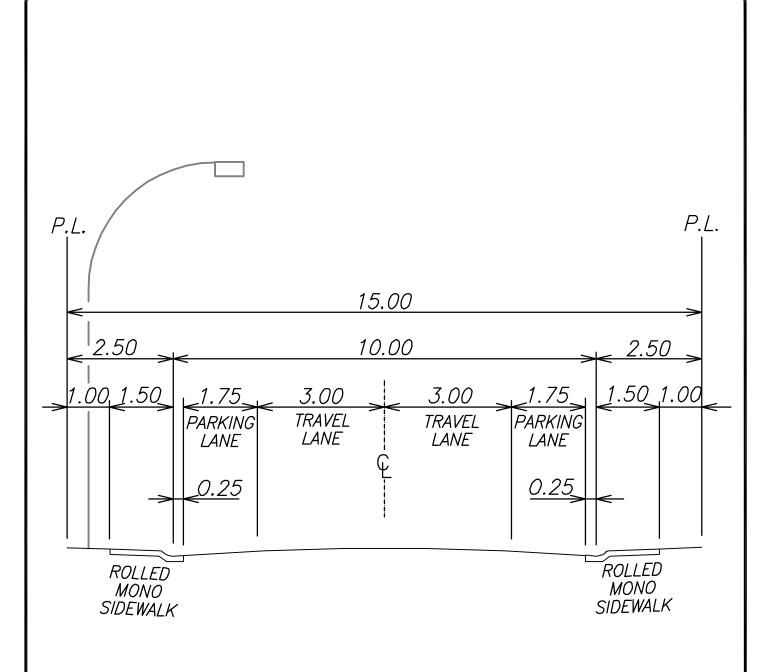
COLLECTOR ROADWAY CROSS-SECTIONS
